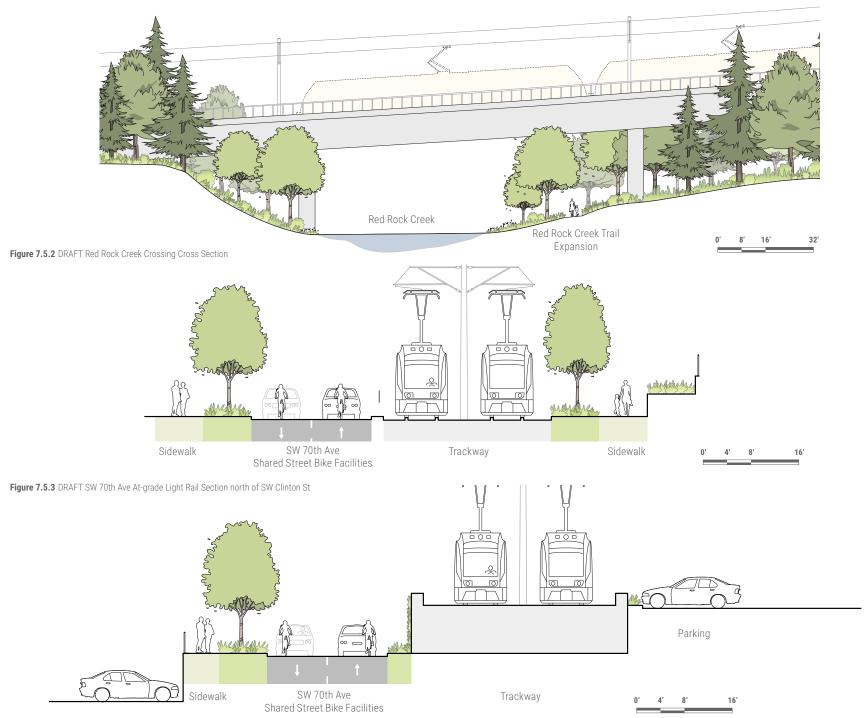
DRAFT SW 70th Ave Light Rail Abutment Section north of SW Elmhurst St
